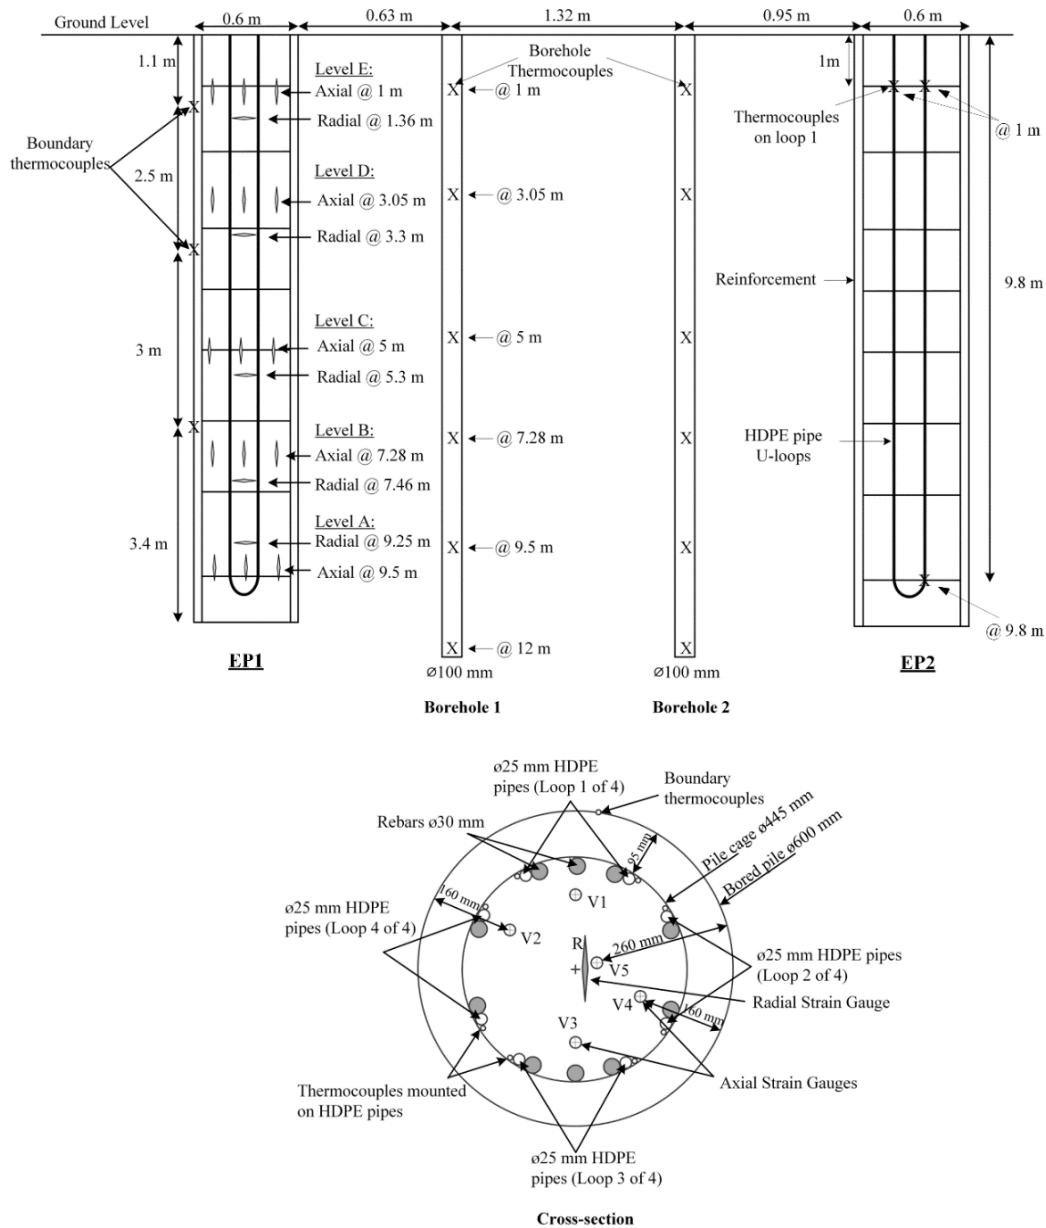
Schematic of the instrumented energy pile and location of the sensors over the cross section at each depth (after Faizal 2018).
